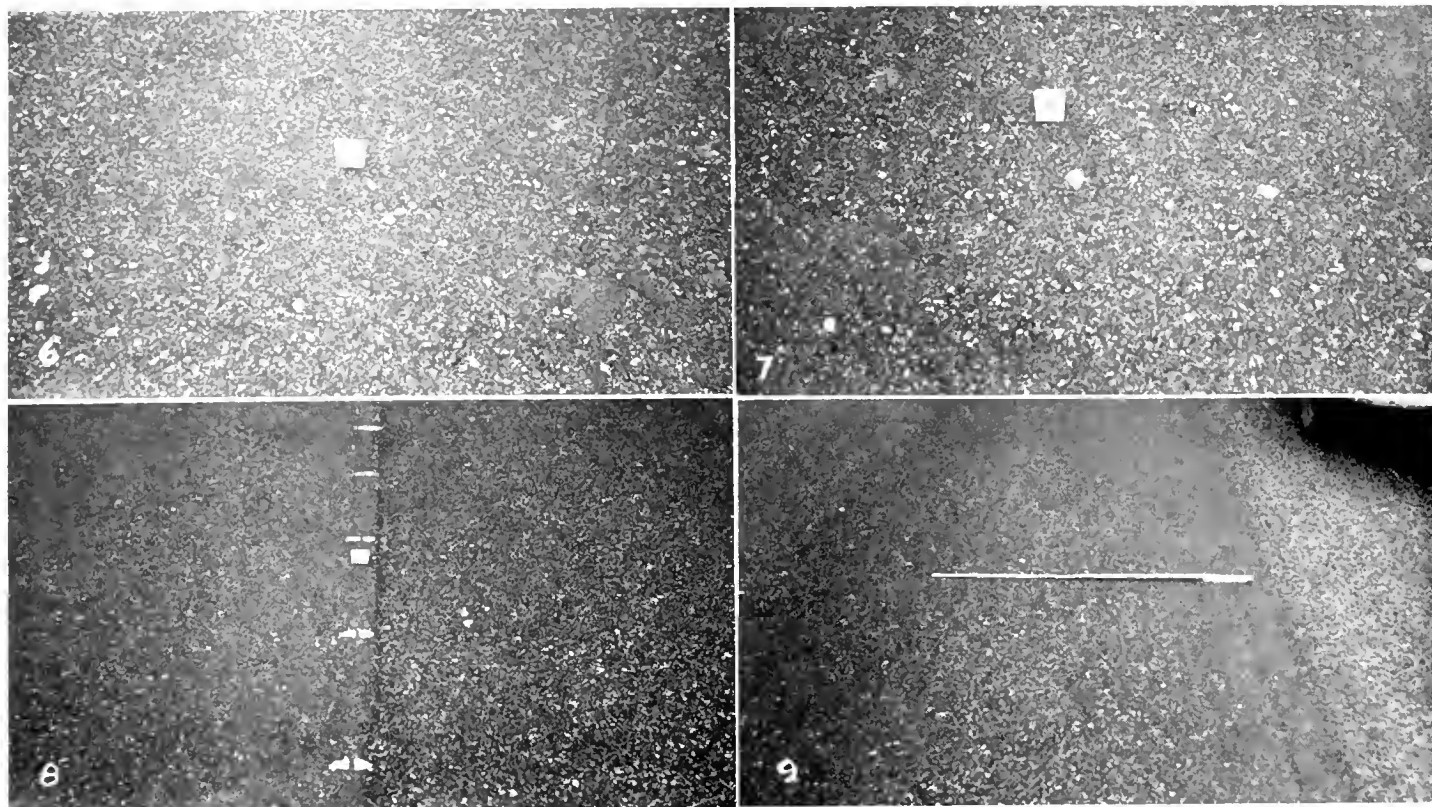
Close-up of surface, 6.6% rubber added. PHOTO 7—Close-up of surface, 4.8% rubber added. PHOTO 8—Plant-mix with rubber, right; plant-mix without rubber, left. PHOTO 9—Plant-mix with rubber, foreground; plant-mix without rubber, background. (Pictures taken February 14, 1951.)
